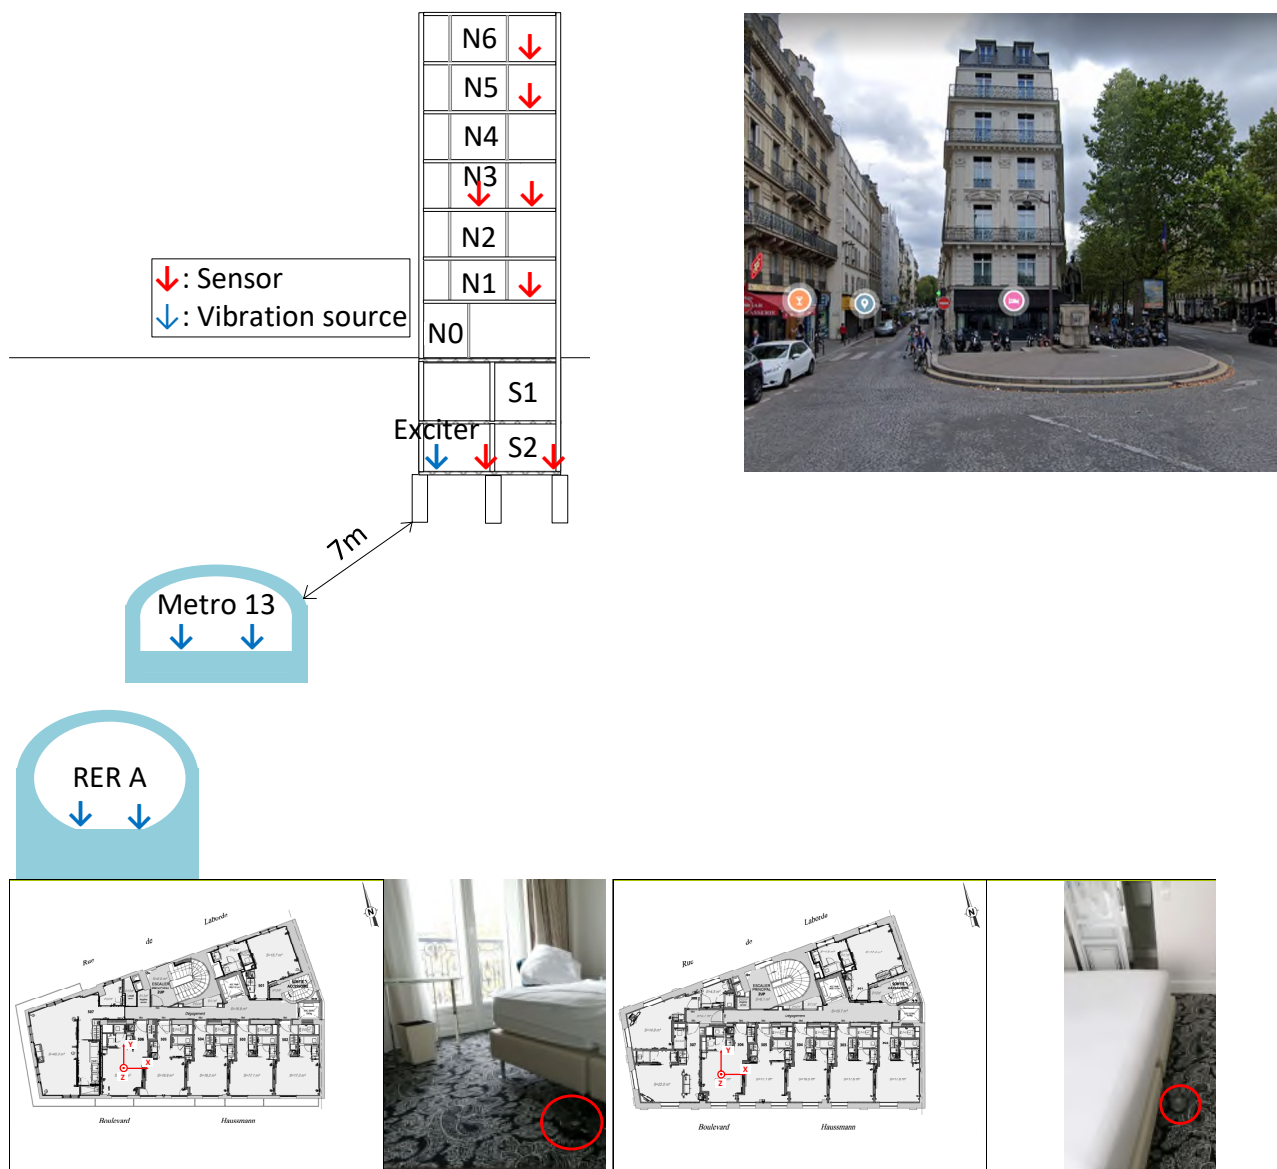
Cross section and location of measurements floor 3 (left) and floor 5 (right)
